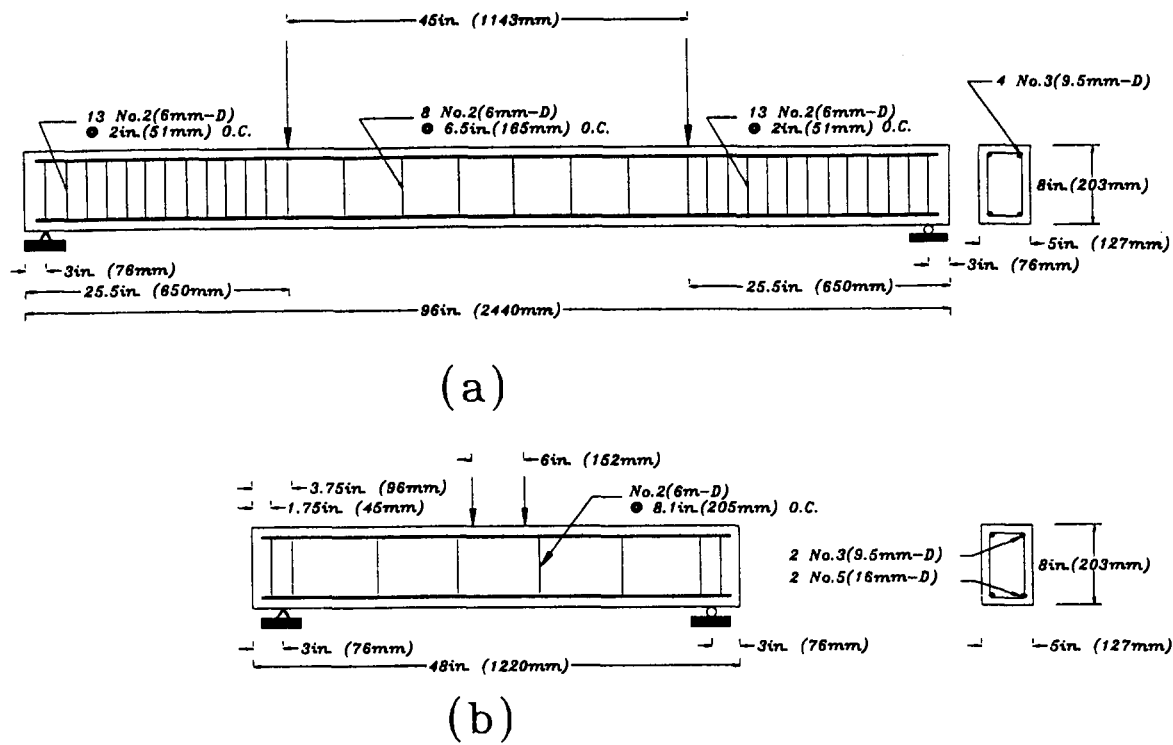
Test Specimens: (a) Flexural Beams; (b) Shear Beams
